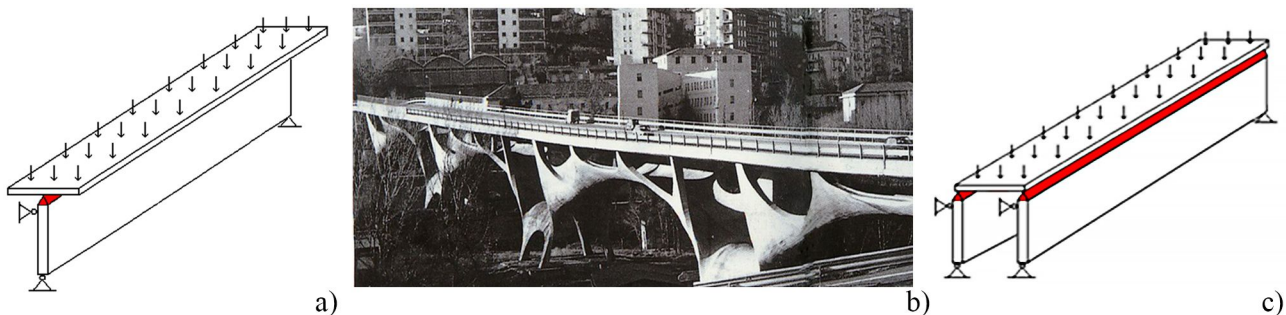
Unstable straight deck (a); Stable straight deck (b) and (c)
